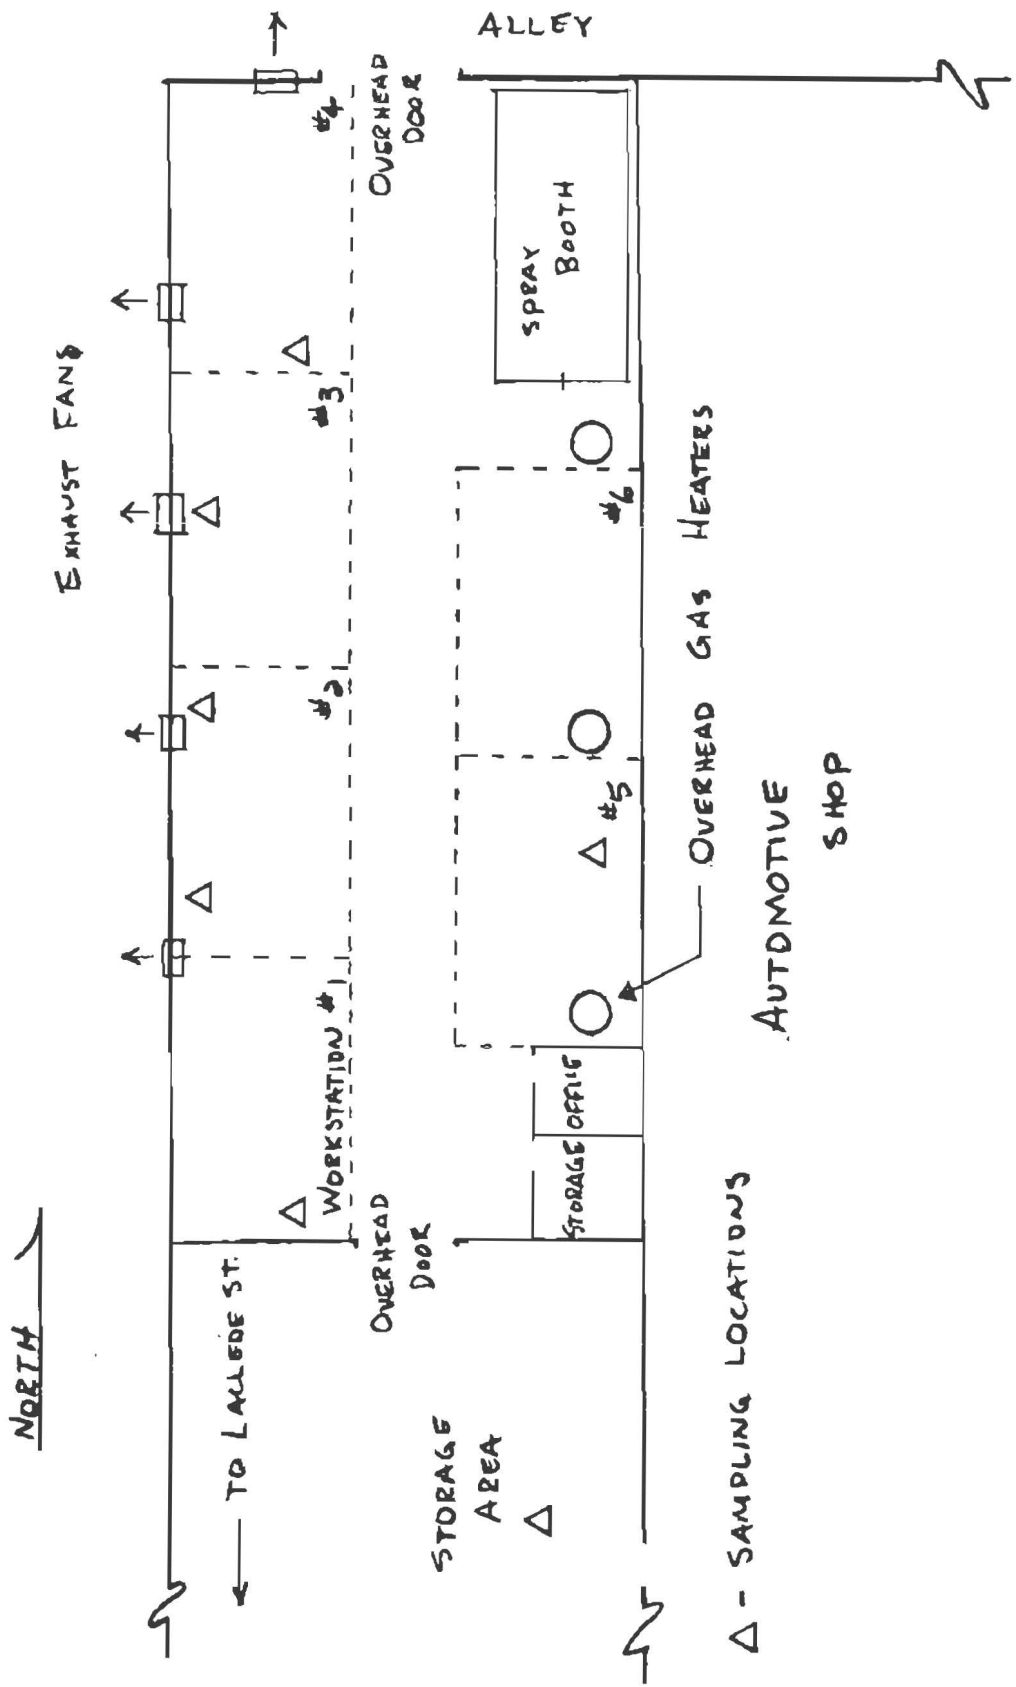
| FLOOR PLAN AUTOBODY REPAIR
